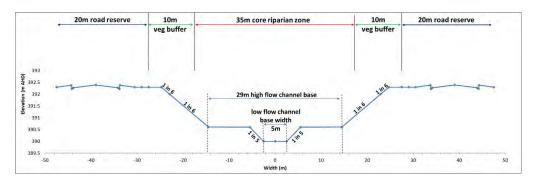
Conceptual arrangement of a typical cross section for a 55m wide waterway corridor
